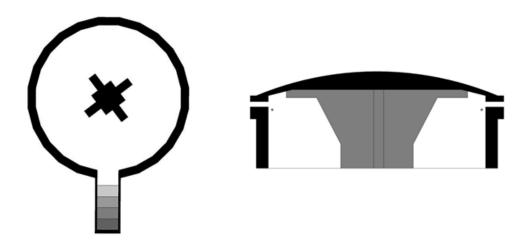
Plan and Section of Cantilevered Pill Box (NTS)
